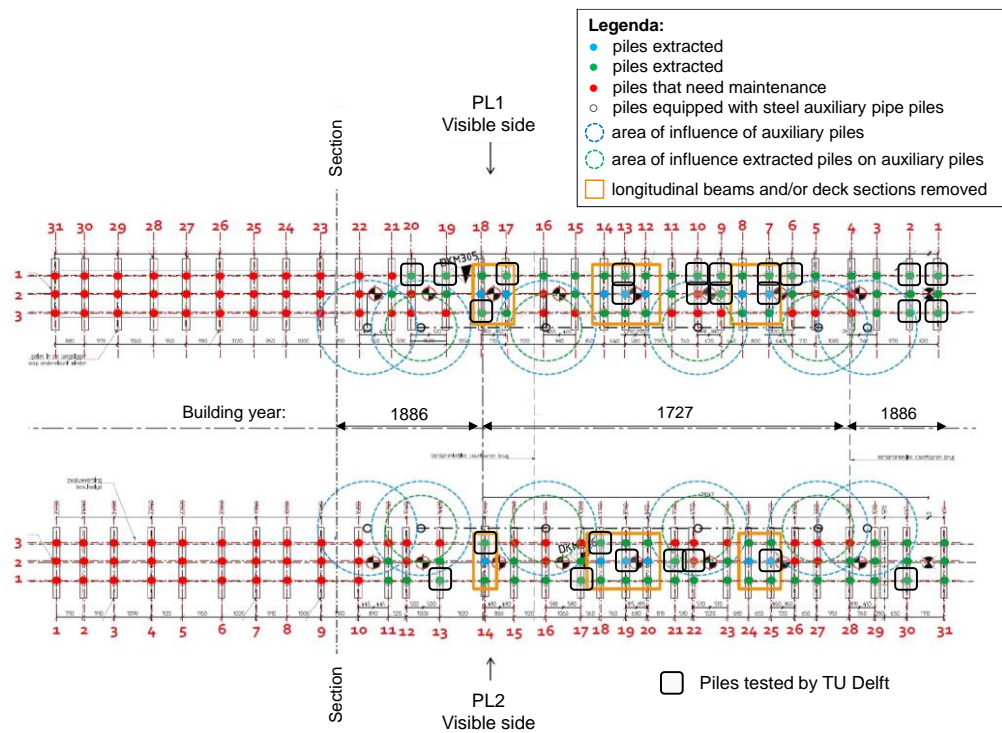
Plan of piles layout of bridge 30 in Amsterdam.
